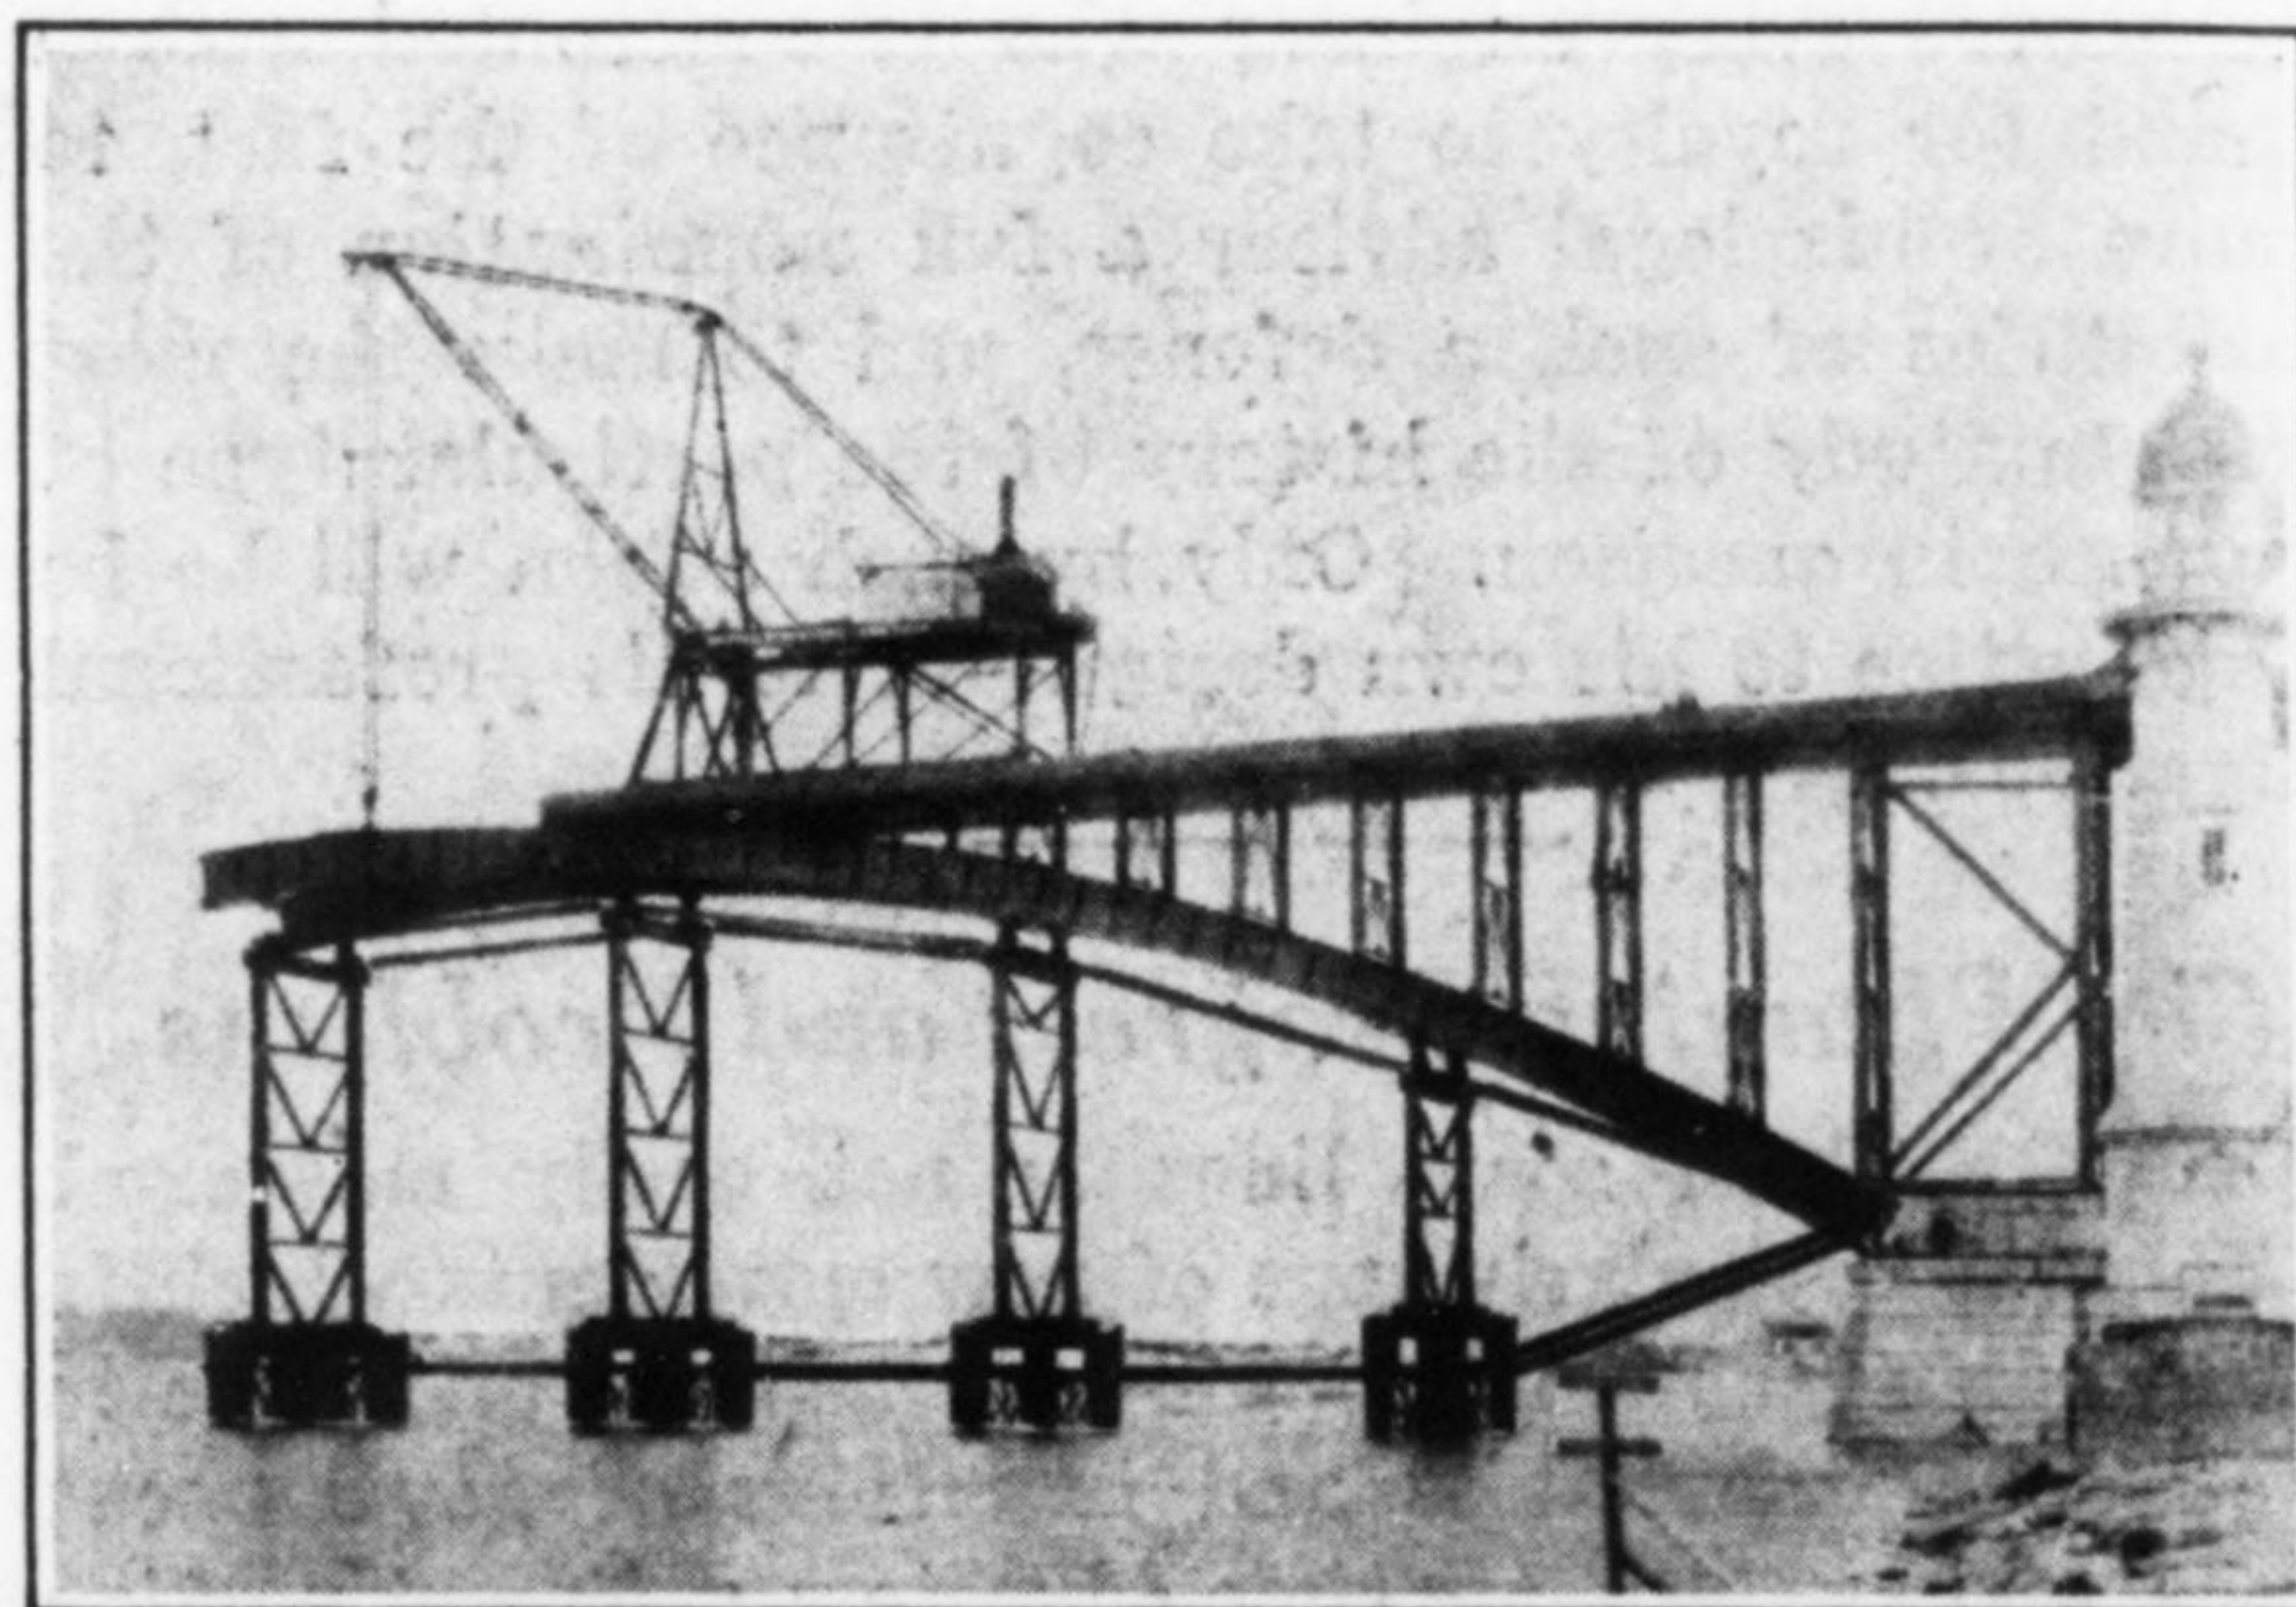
ARCH ERECTION, FIRST AND SECOND ARCH SPAN
